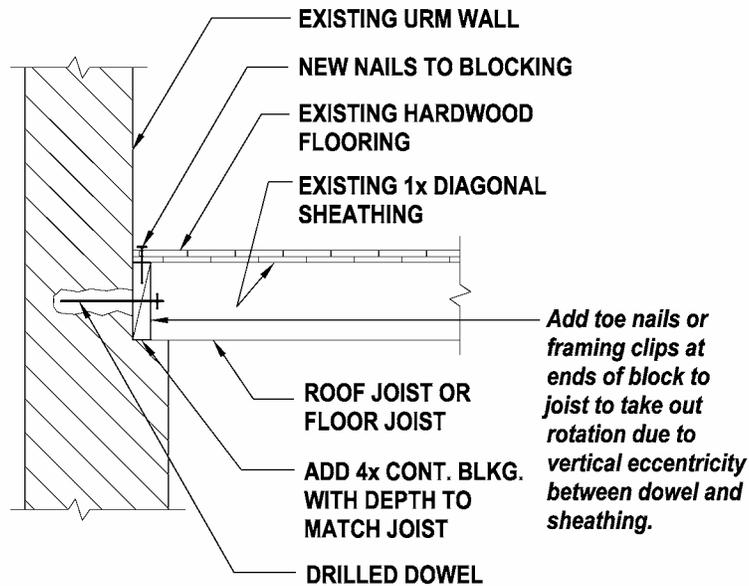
Tension Anchors Installed from Above the Floor
